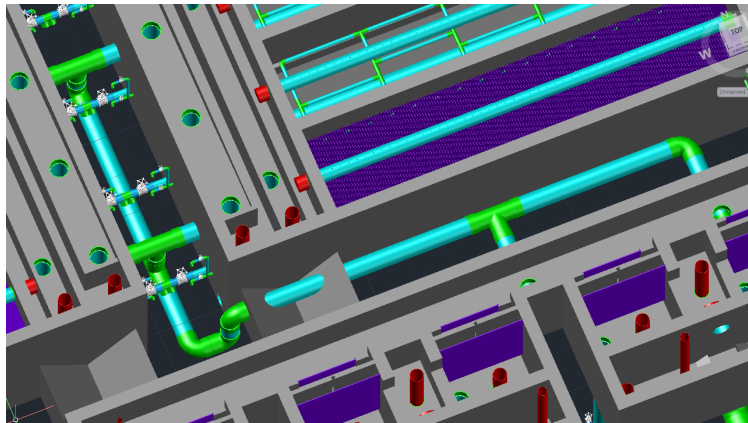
This shows an AutoCAD rendering of the connection plumbing between the sedimentation tank exit channel and the filter inlet channel. This plumbing will be inside the drainage channel of the plant.
